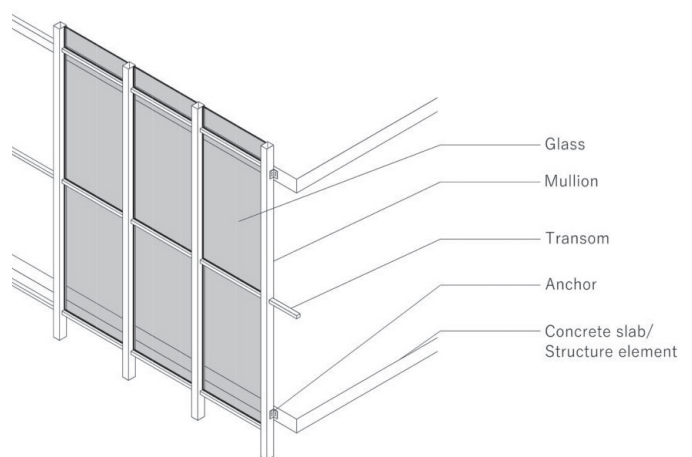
Components of a stick-built curtain wall façade used for low- and midrise buildings in Europe (Dorji, 2024))
